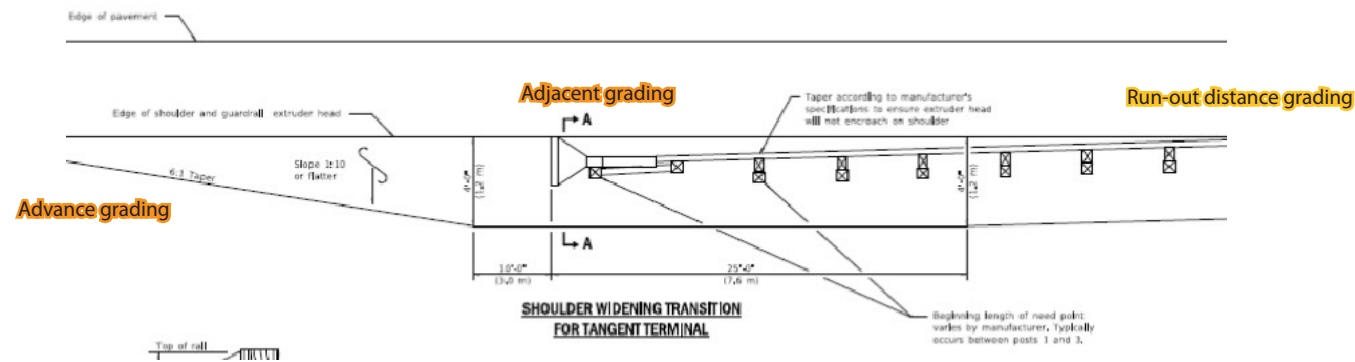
Shoulder Widening for Type 1 (Special) Guardrail Terminal
